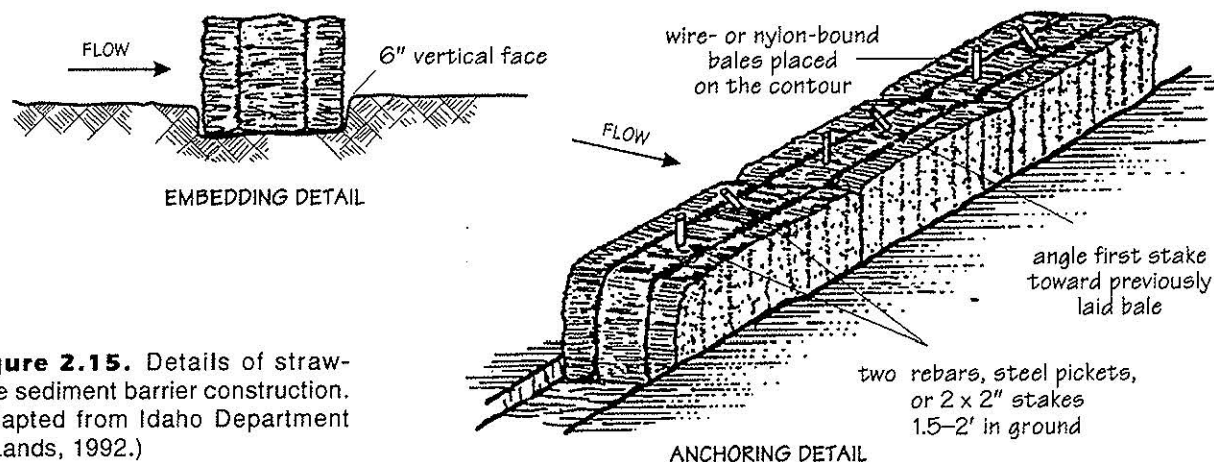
Details of straw-bale sediment barrier construction. (Adapted from Idaho Department of Lands, 1992.)
